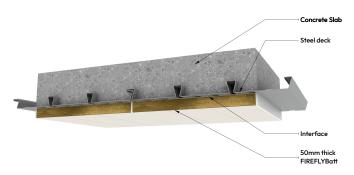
Composite steel deck slab protected with FIREFLYBatt system
